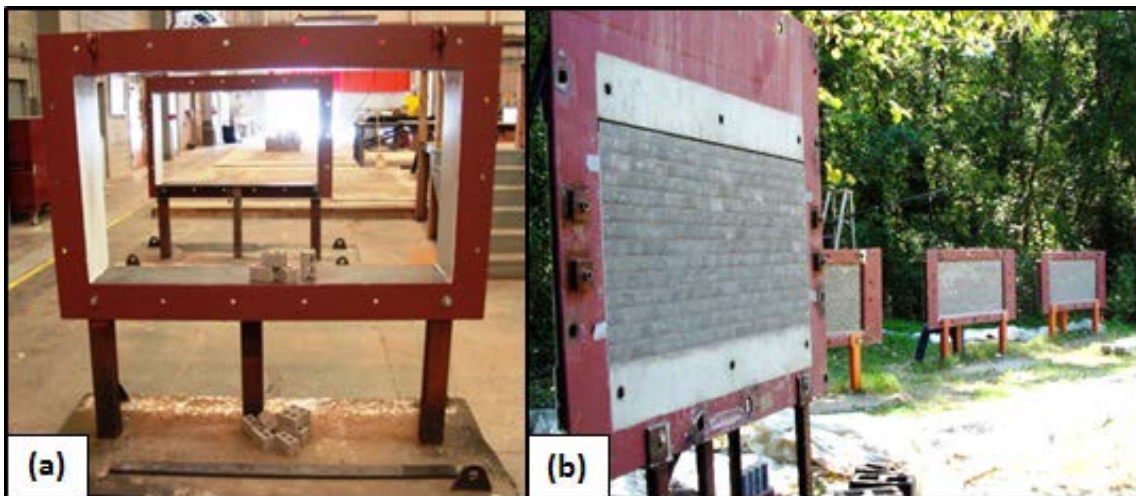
Subscale test frames. (a) Steel frames used in the static experiments. (b) Reinforced concrete and steel frames used in HE dynamic experiments.
